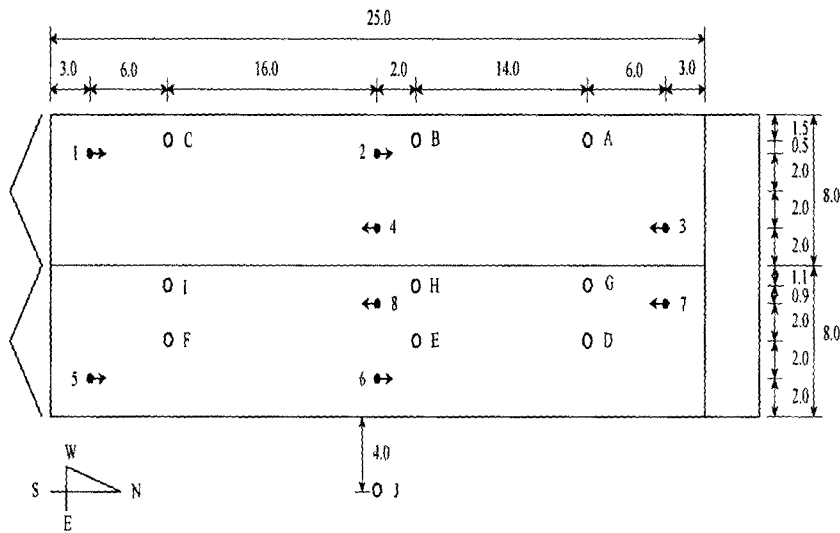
Plan view of the experimental greenhouse (unit:m)
